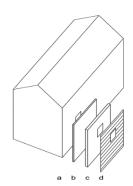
Possible TES configuration: existing structure (a), adaptation layer (b), timber framework and insulation as main layer (c), cladding layer on the exterior side (d)
